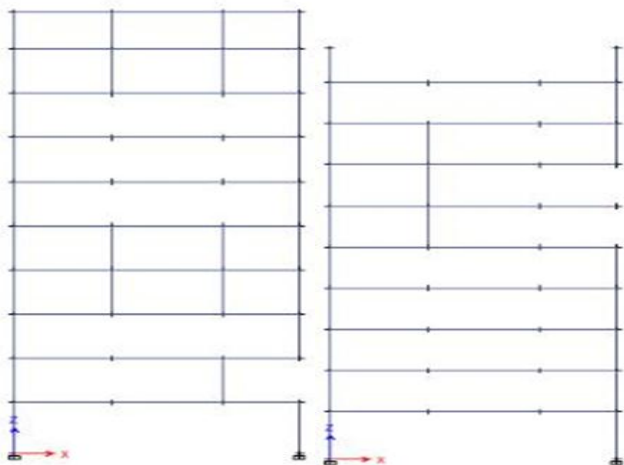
&4 Plan and 3d Section view of Structure model with deflection
